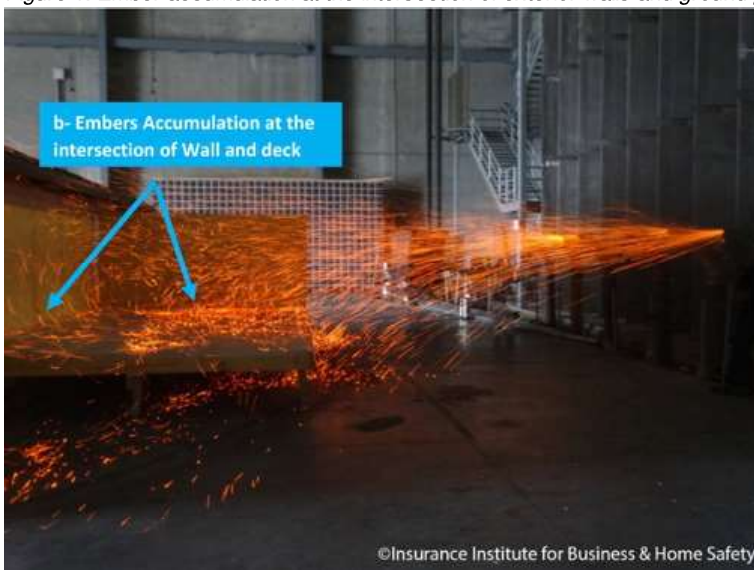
Ember accumulation at the intersection of exterior walls and a deck assembly [2].
